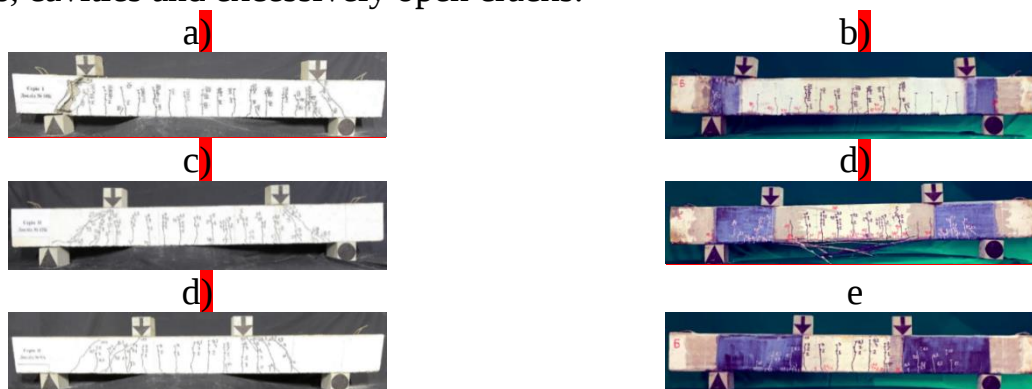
The nature of crack formation and failure of concrete beams made of BFRP before (a, c, d) and after (b, d, e) their reinforcement with carbon fiber sheet in the lower tension zone and in the support sections with small, medium and large shear spans
